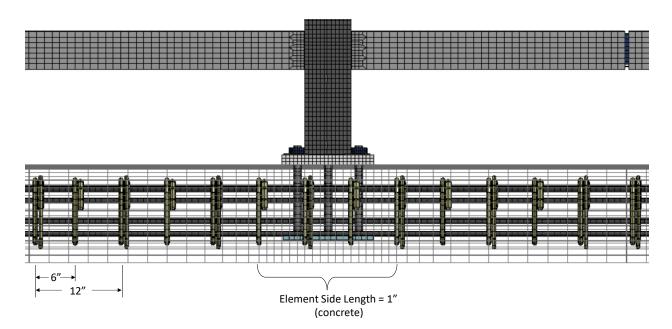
Plan view of sidewalk model (from back of bridge rail).
